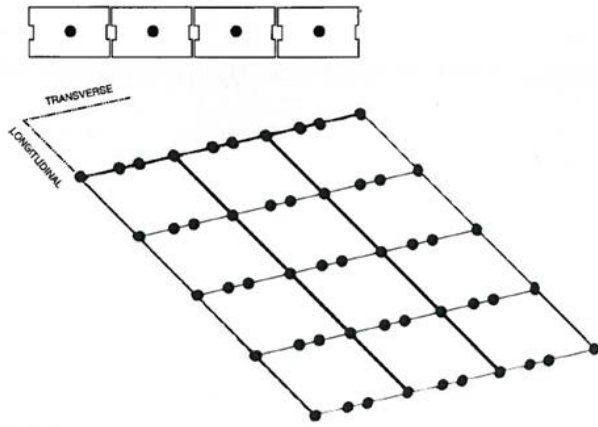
Modelling the bridge deck as grillage analysis (Badwan and Liang, 2007)
